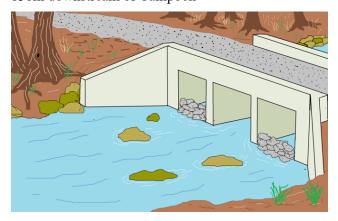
Illustration of Rock Weirs at Culvert Entrance
